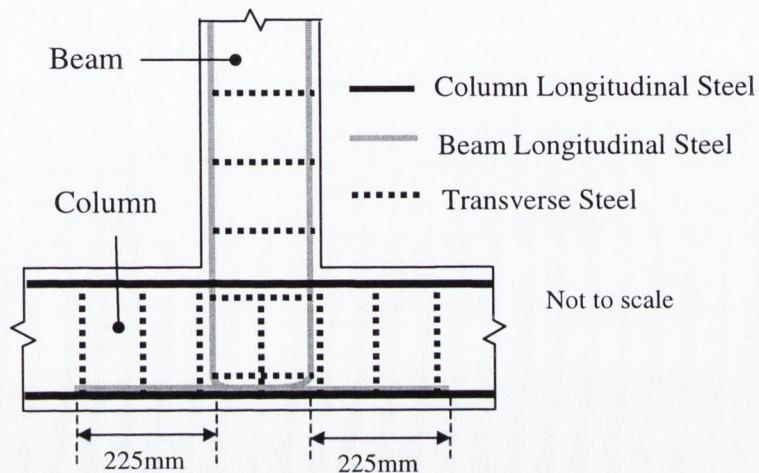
Joint detail of specimen C1 (Test Series 5)
